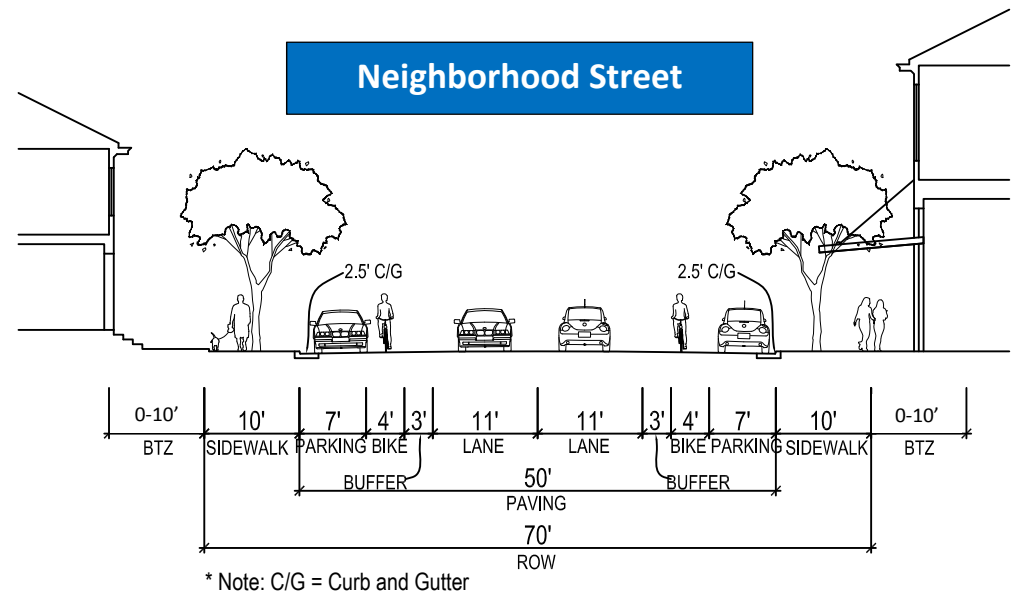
Street Type 3: Neighborhood Street Cross Section
